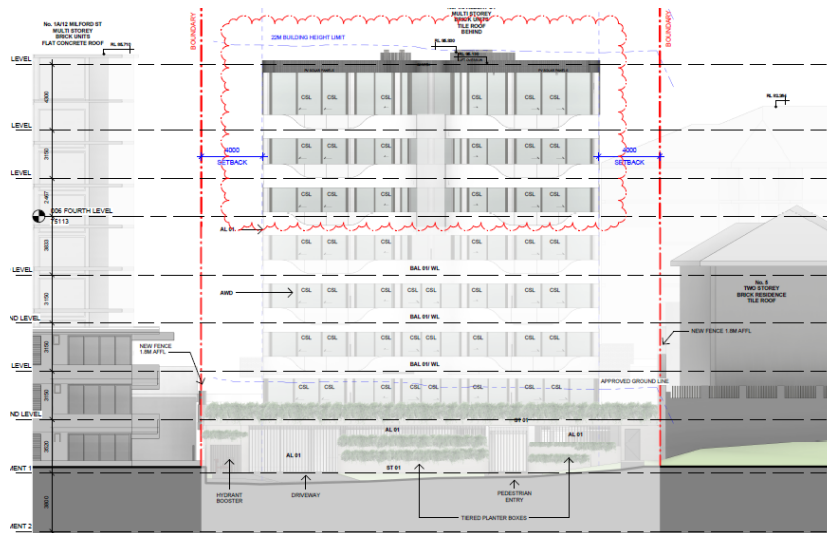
Proposed front elevation – 3-4 Llanfoyst Street, Randwick (Source: Orosi)
